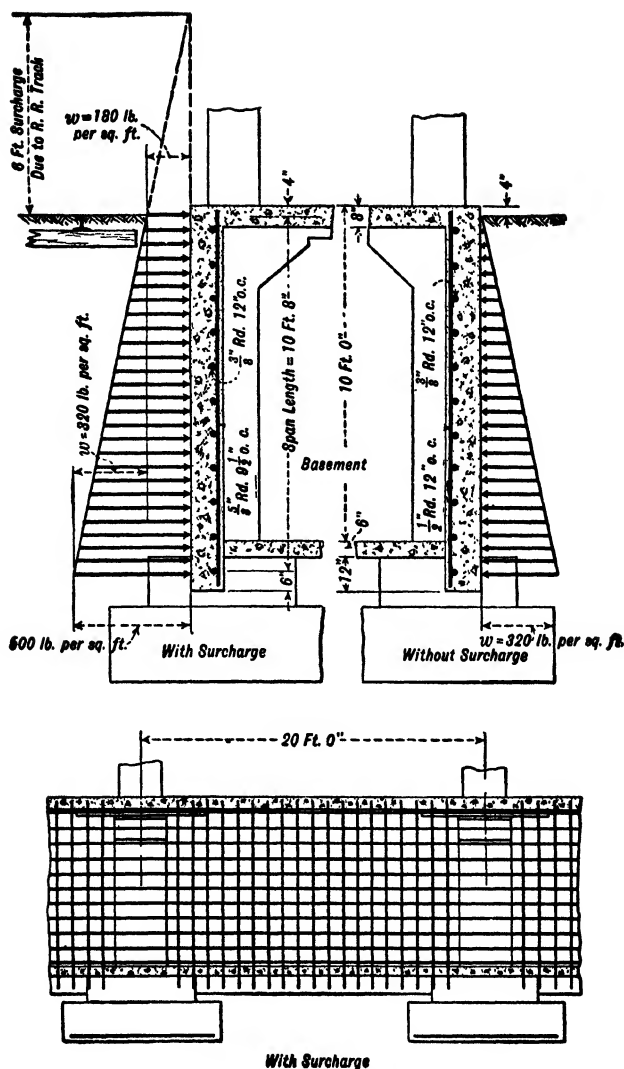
Details of Basement Wall Supported on Top and Bottom.
